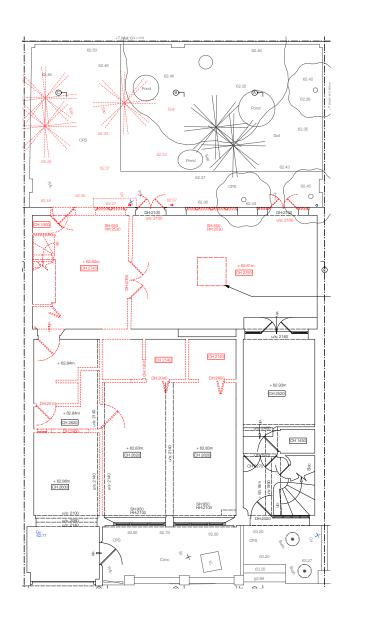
Existing ground floor plan of no. 75 Belsize Lane with demolition shown in red.
